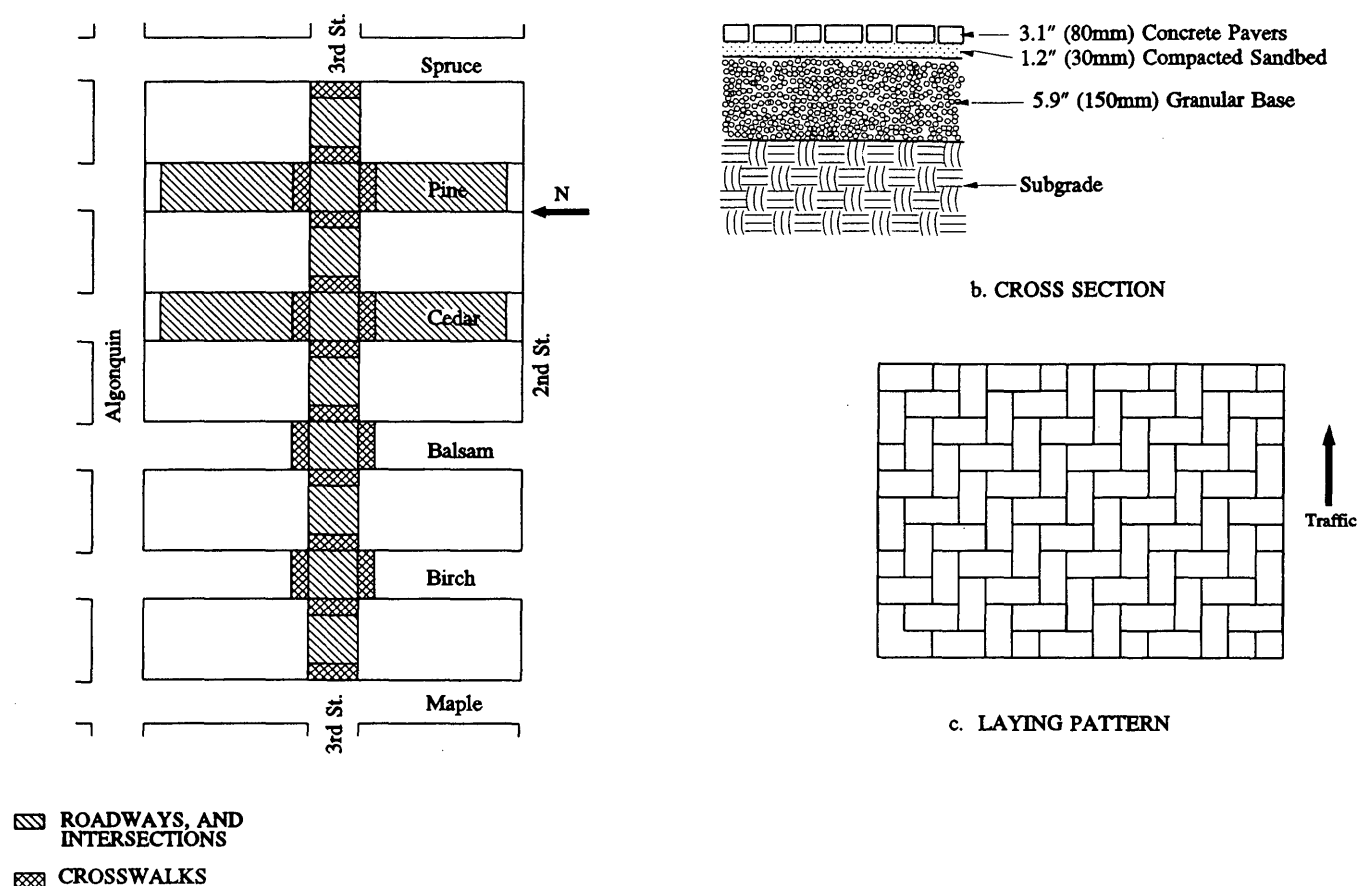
Fayetteville, North Carolina: site layout, pavement cross section, and laying pattern.
